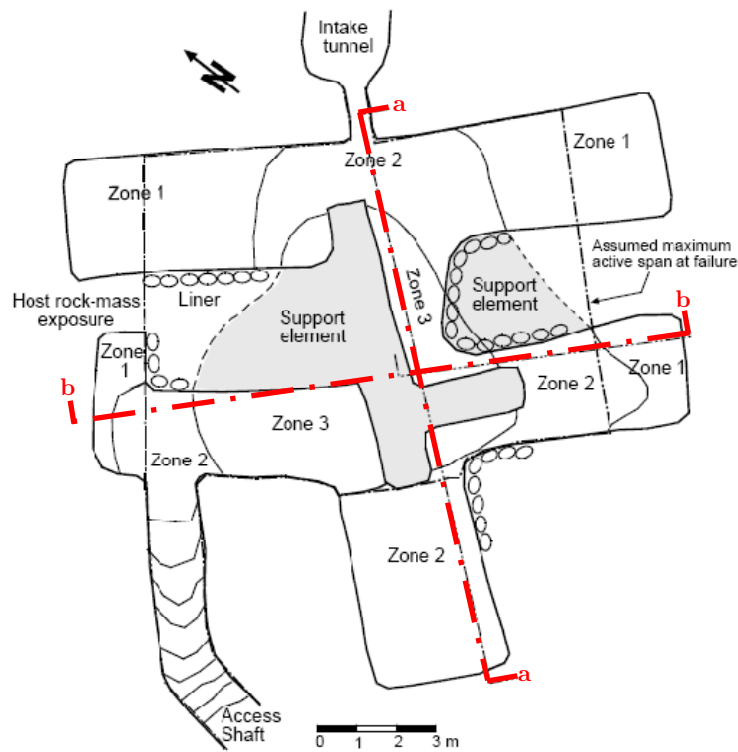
Schematic layout of the water storage cavern after Hatzor & Benary (1998)
